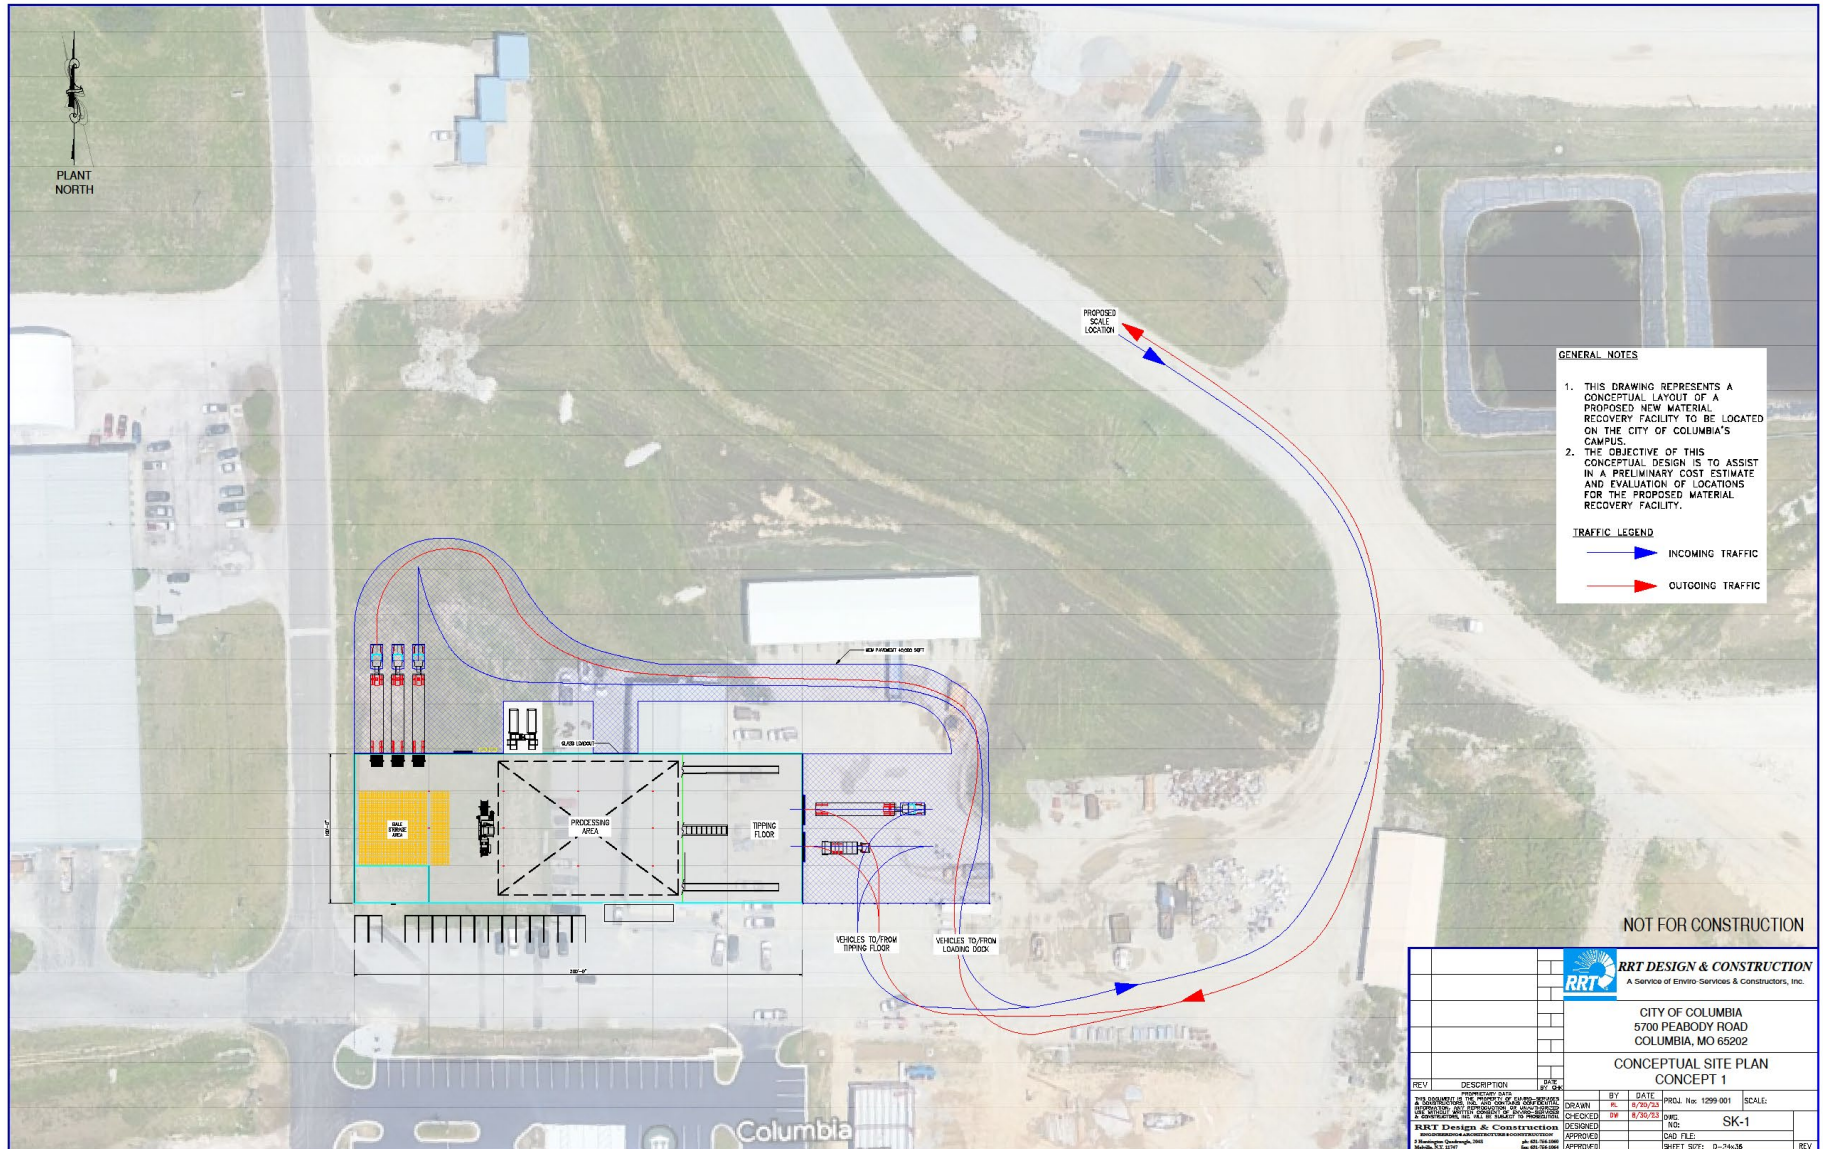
Conceptual Site Plan for New, Larger-Capacity MRF on Site of Existing LOC (Location B)
